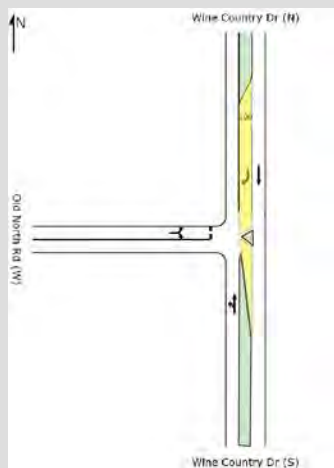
Proposed Road and Intersection Upgrade (full development)
